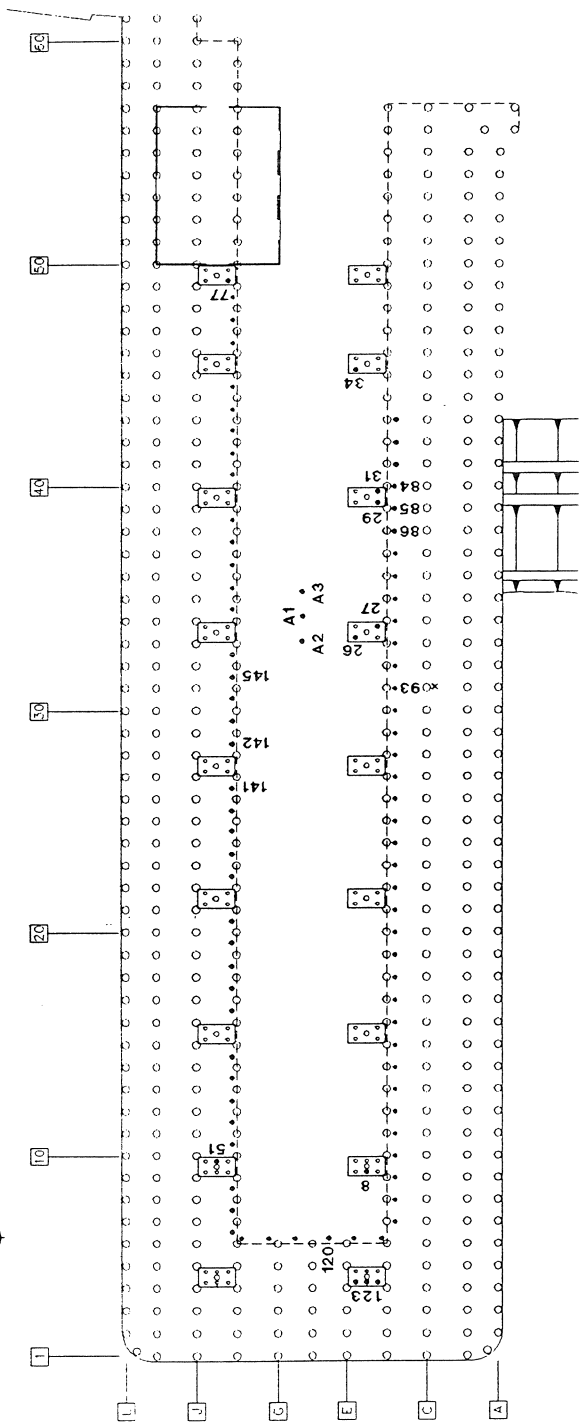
Plan of Pier Showing New Piles and Existing Caissons
